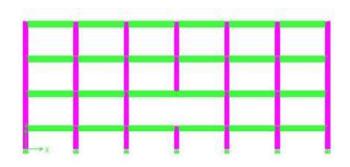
Elevation view of G+3 building with floating columns at middle of exterior frame
